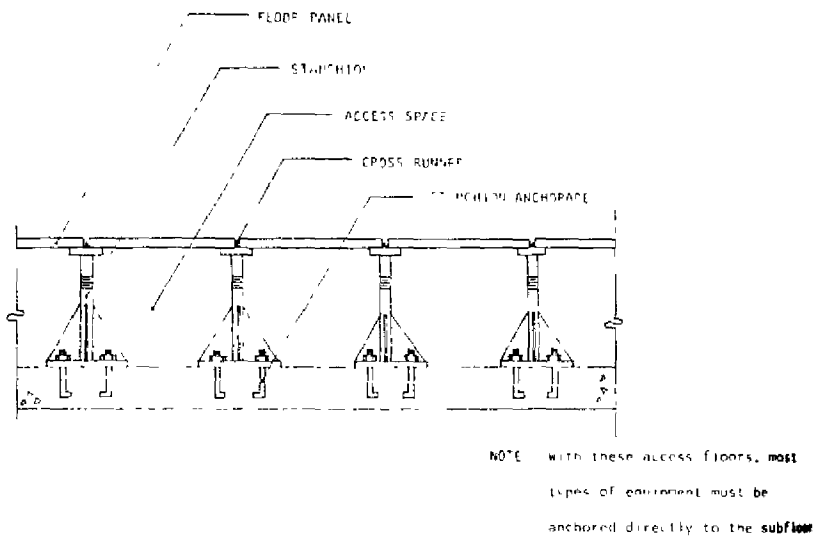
Access floor systems. Noninterlocking type access floors showing floor panels and stanchions.
